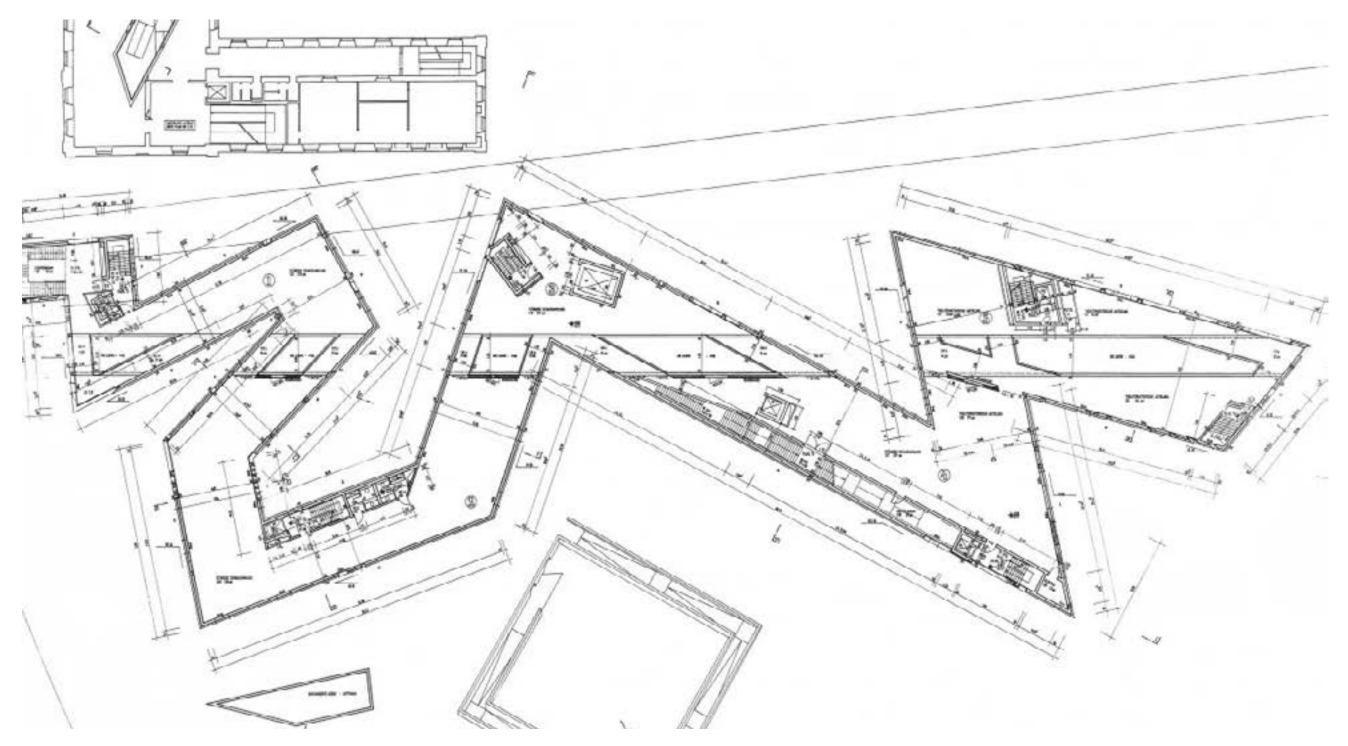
| Floor Plan, photo credit | Studio Libeskind
